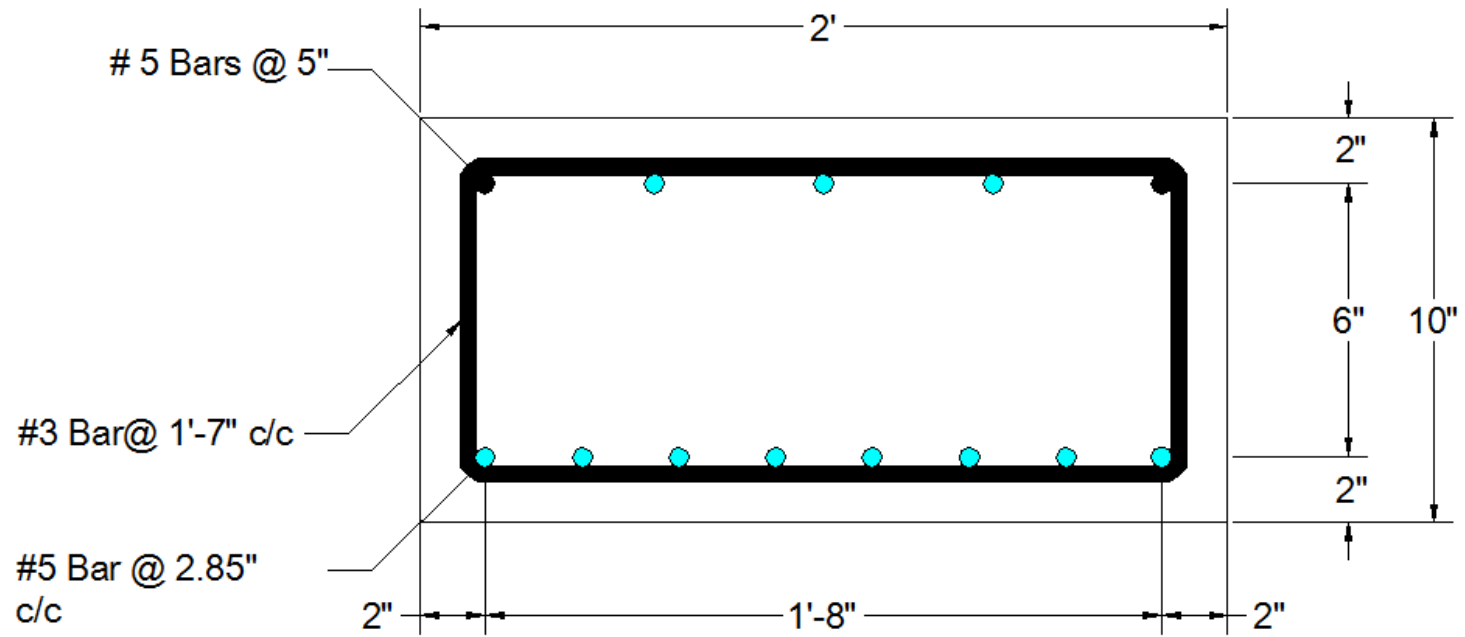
Cross-sectional Area of S2-1 showing Single Bottom Reinforcement
